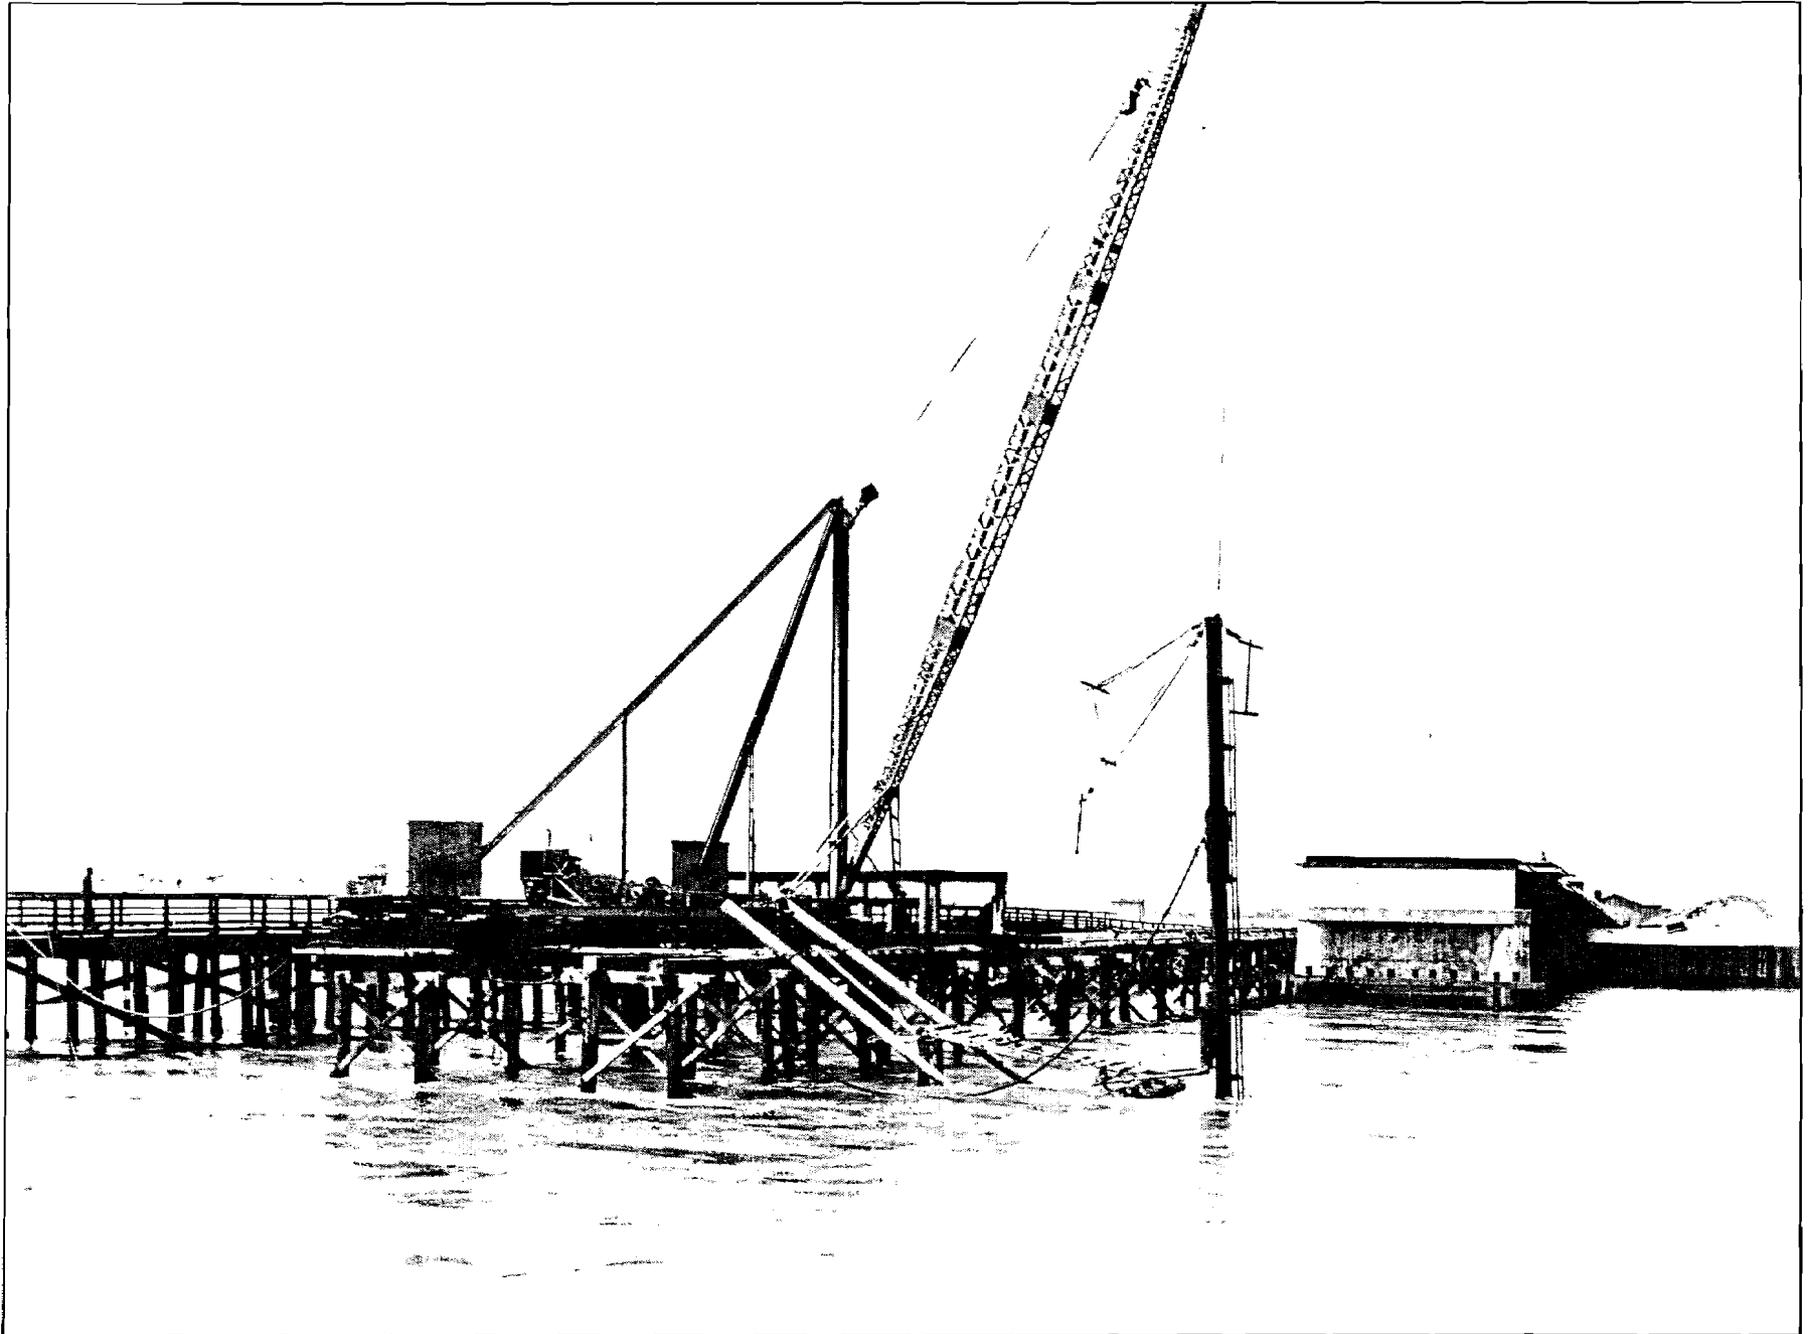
Cullen Bridge construction. North rest pier vicinity toward northwest. June 12, 1939. Delaware State Highway Department collection. Image #0333. Delaware Public Archives, Dover.
